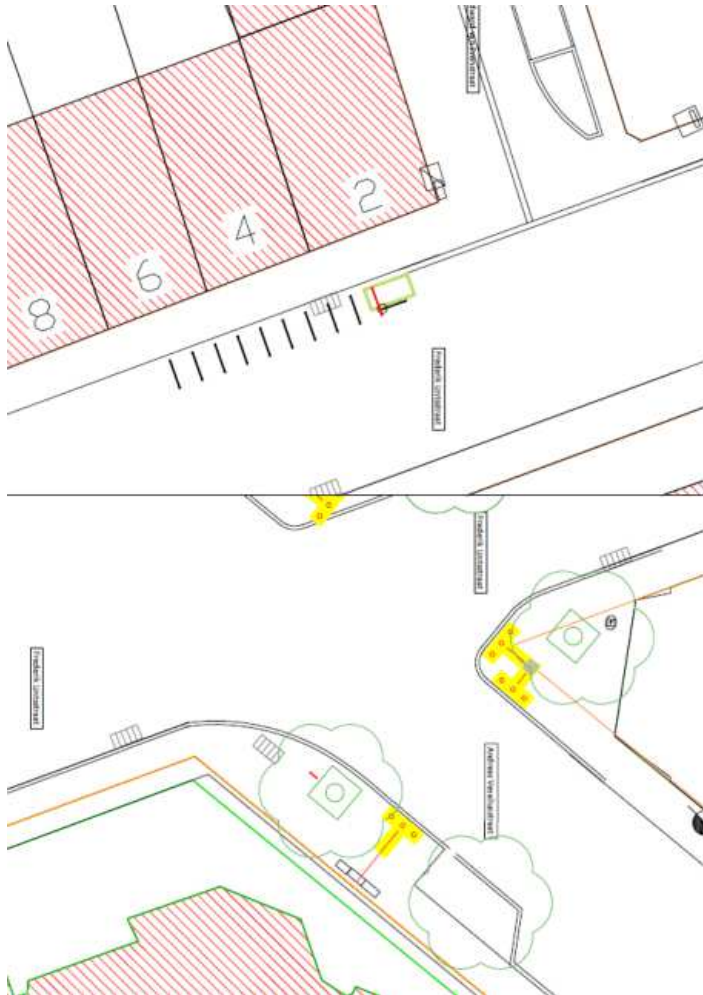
June 2021 – Site plan information pillar of eHUB OCMW Leuven, implemented since June 2021
